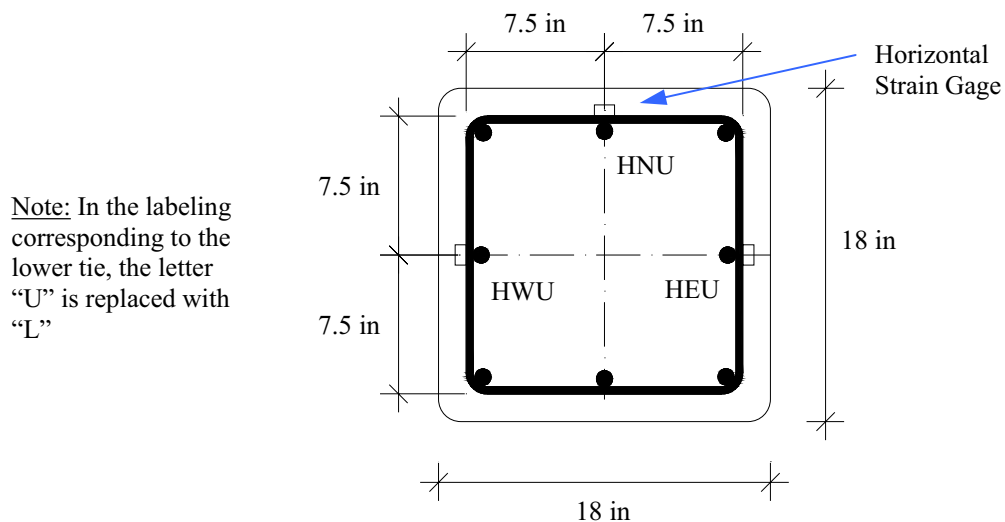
Section A-A & C-C; Strain Gages Location on the Tie; Specimens C1, C2 & C3
